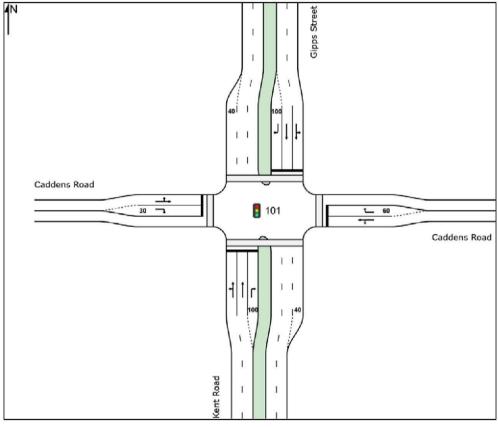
Signalised intersection of Gipps Street and Kent Road with Caddens Road (SIDRA)
